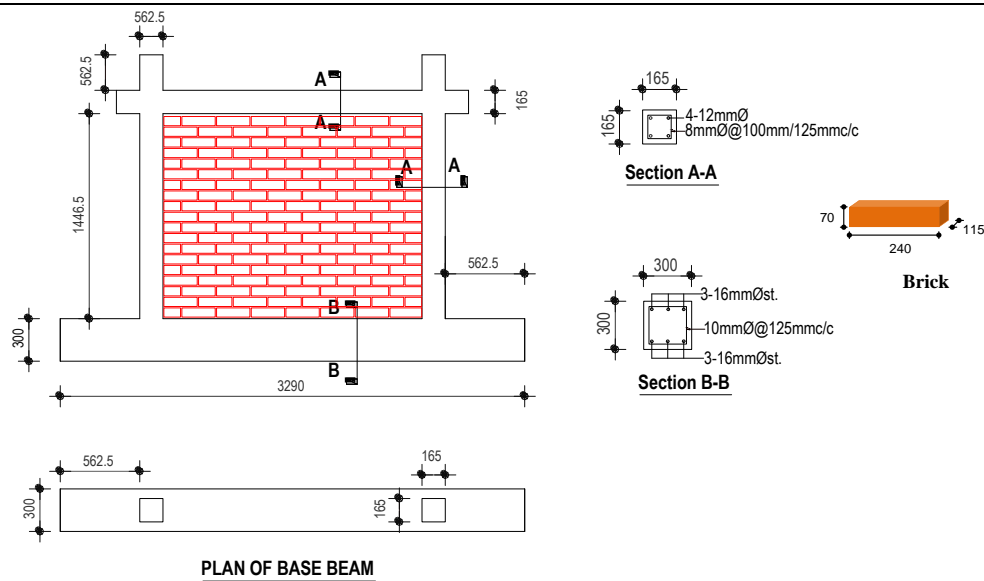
Geometry of control infilled masonry specimen (IM) [All dimensions are in mm]
